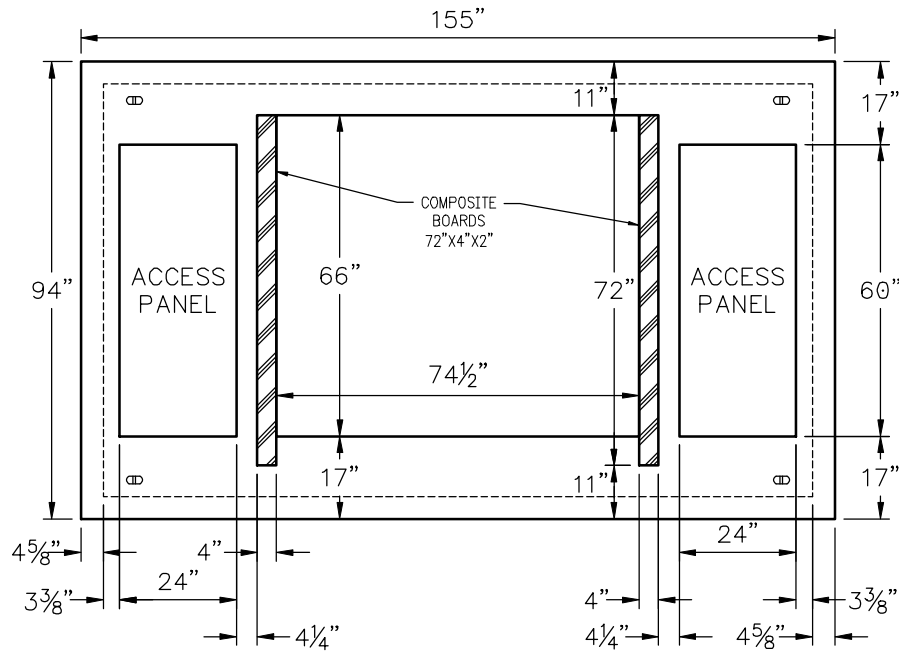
Padvault Pad Layout (SI# 7992789) for 25 kV, 600-Amp Type-9/11 Switchgear
